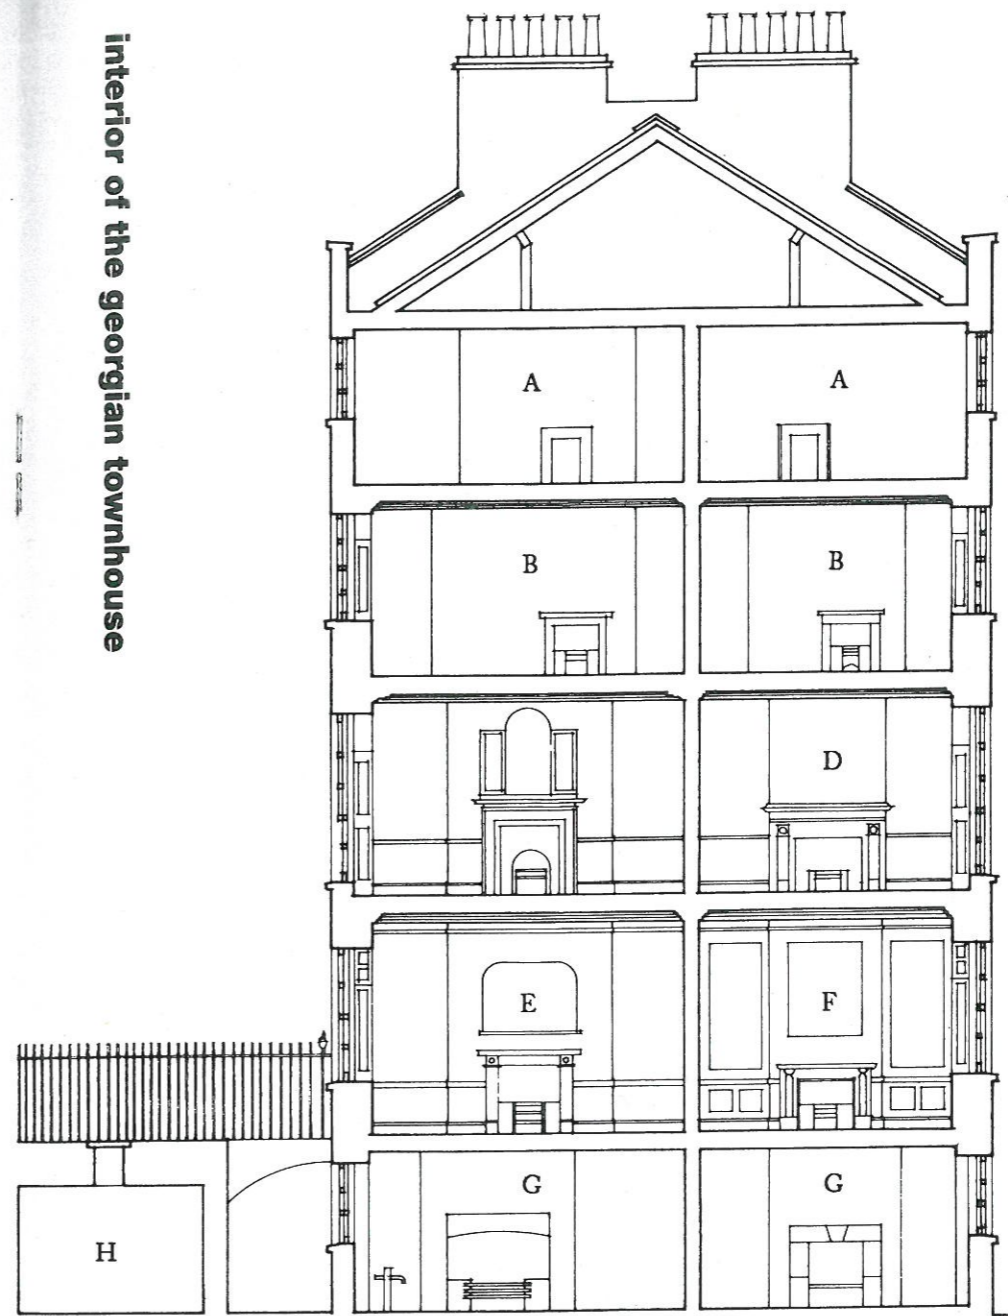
Section of a five-storey Georgian townhouse. The grandest rooms are on the ground and first floors as seen in the ornate panelling and fireplaces and the window heights.
